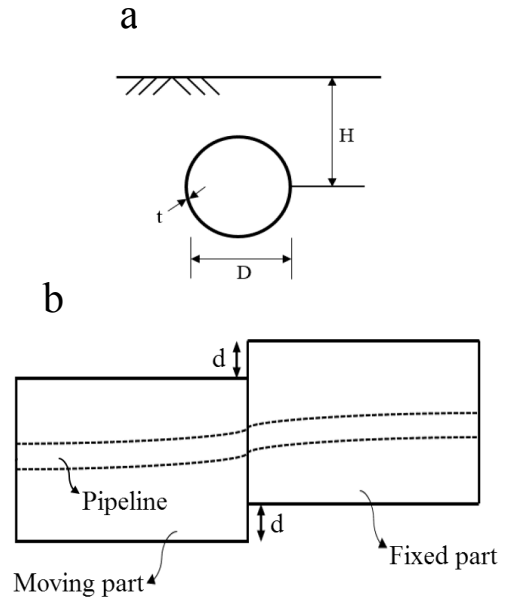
Definition of fault movement parameters (a) Cross-section (b) Plan.
